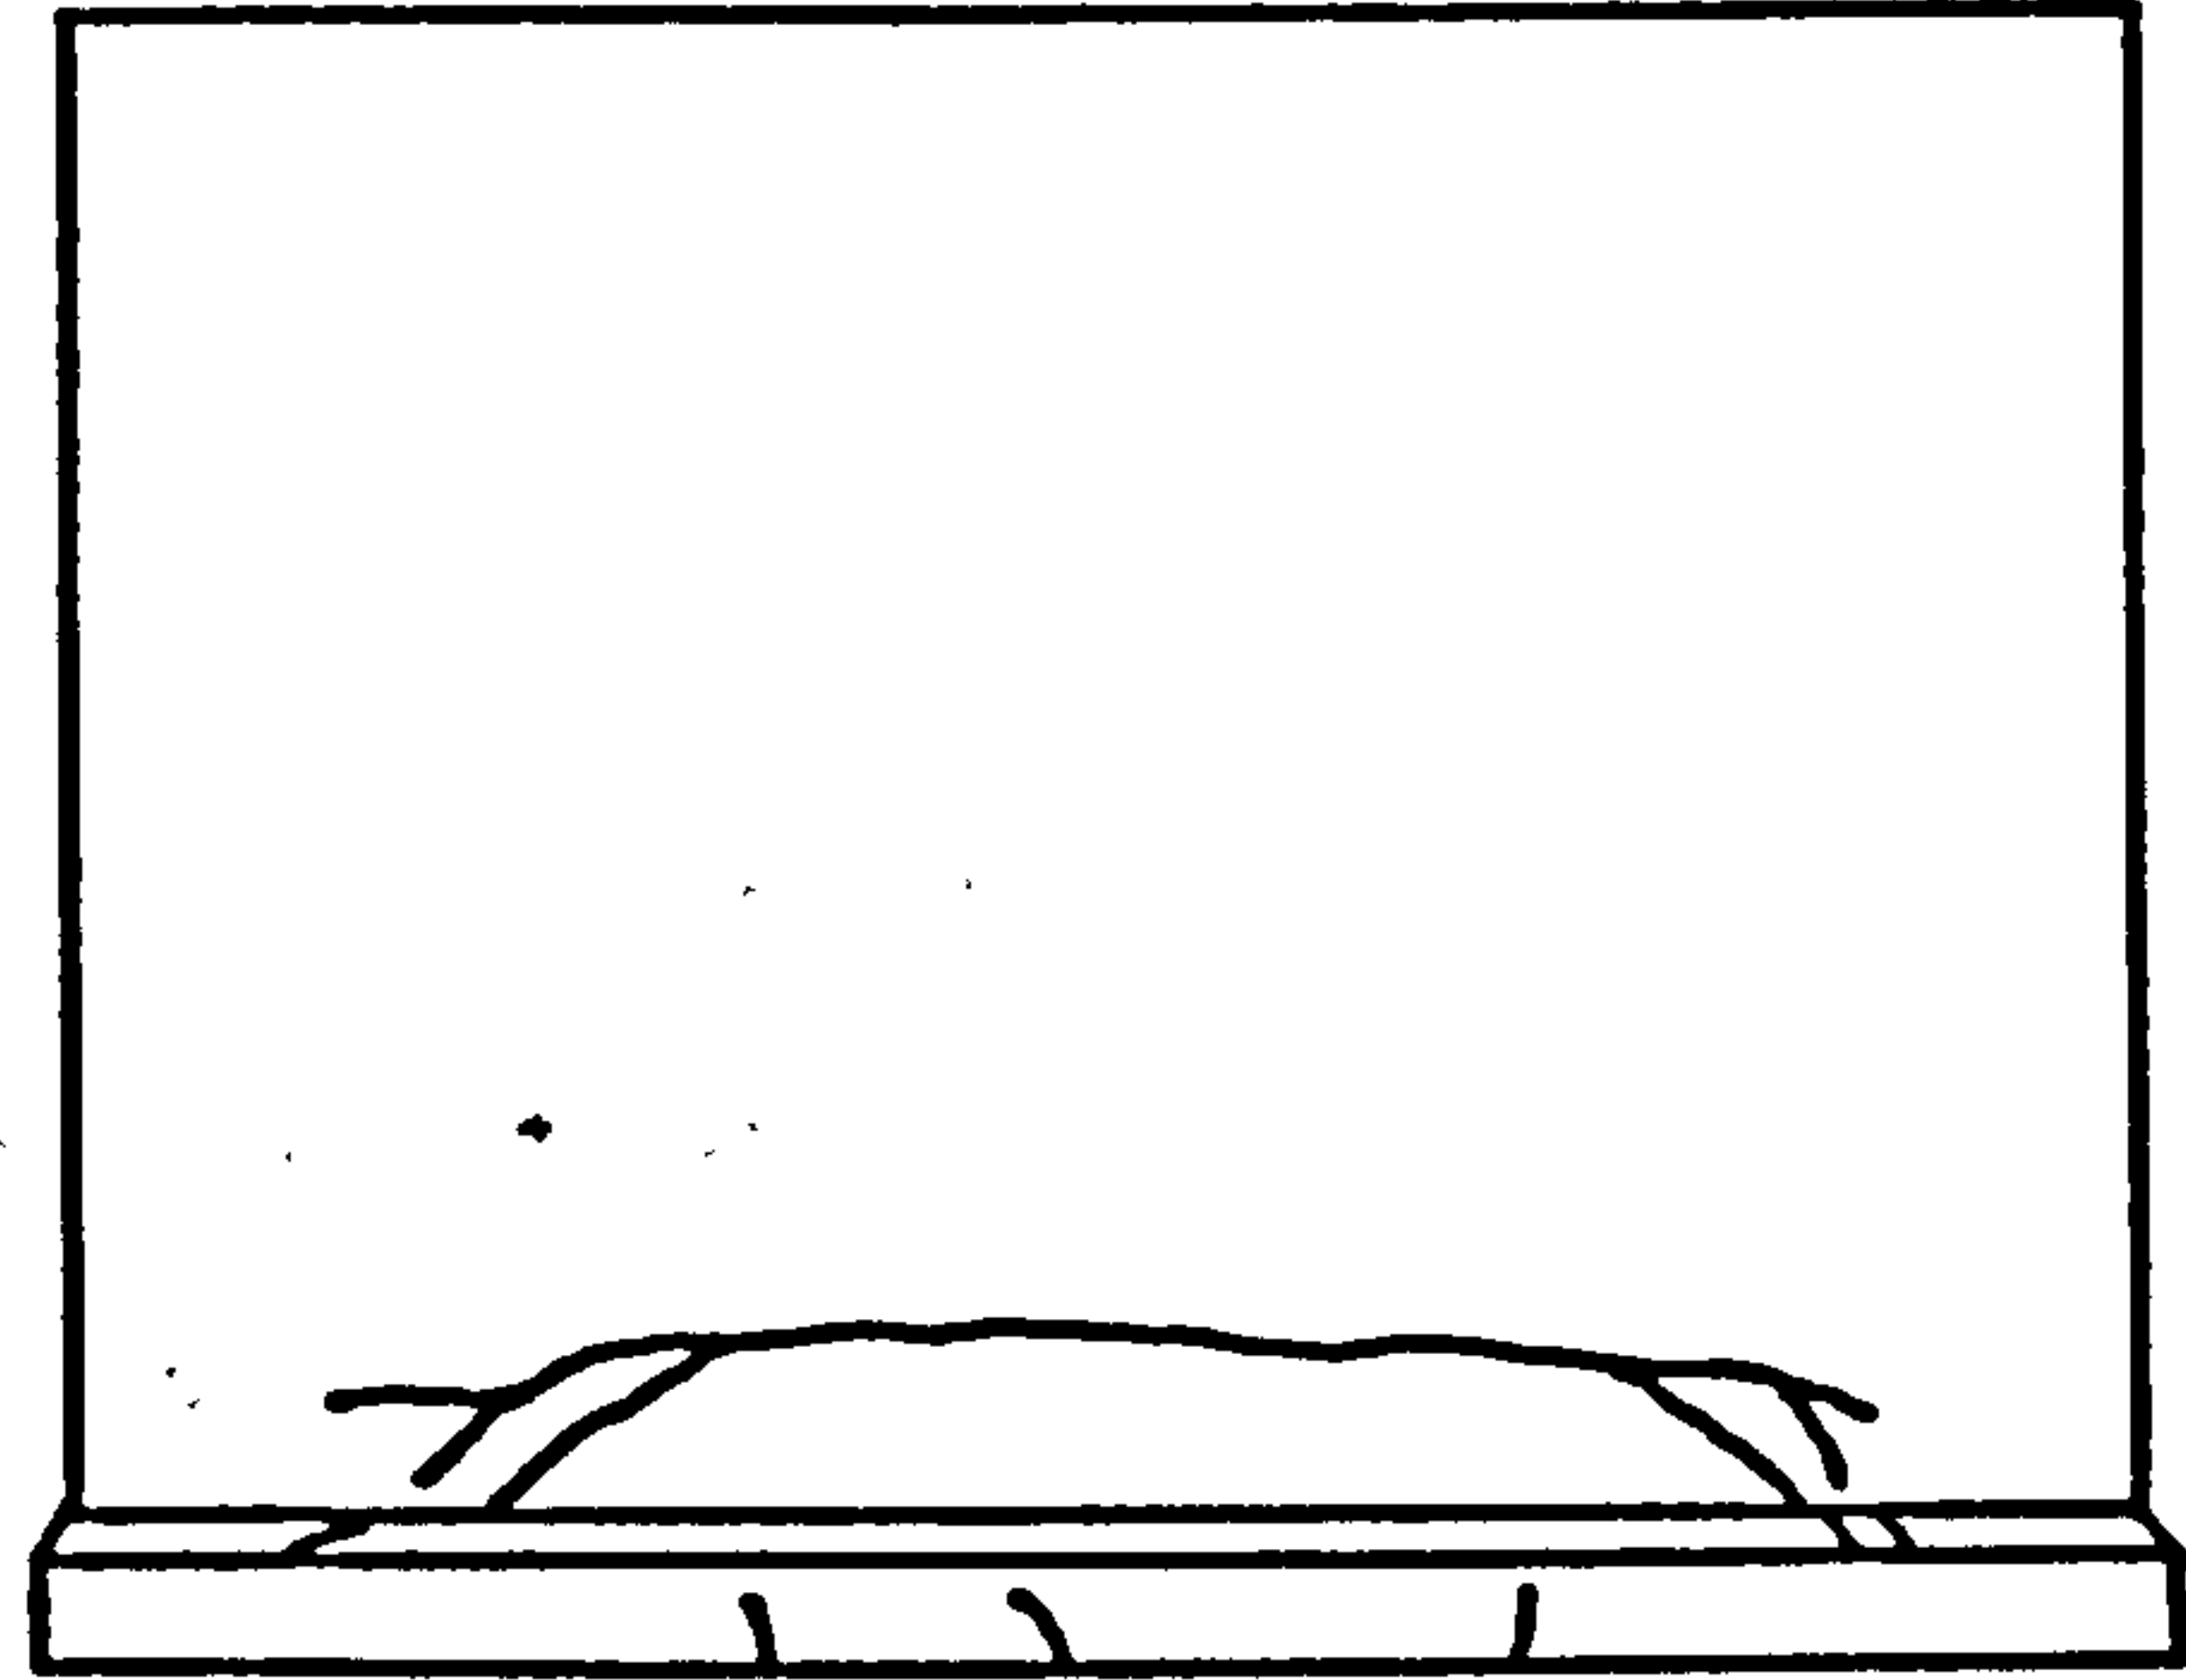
Crack pattern of deep beams loaded at the soffit
